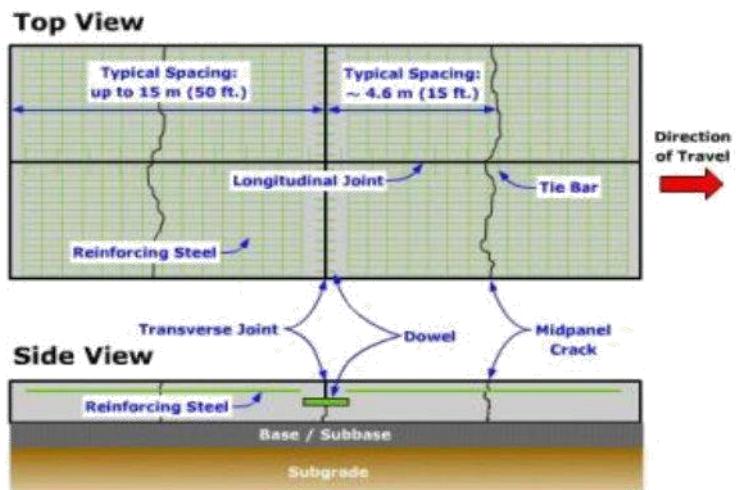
Jointed Reinforced Concrete Pavement (JRCP).
